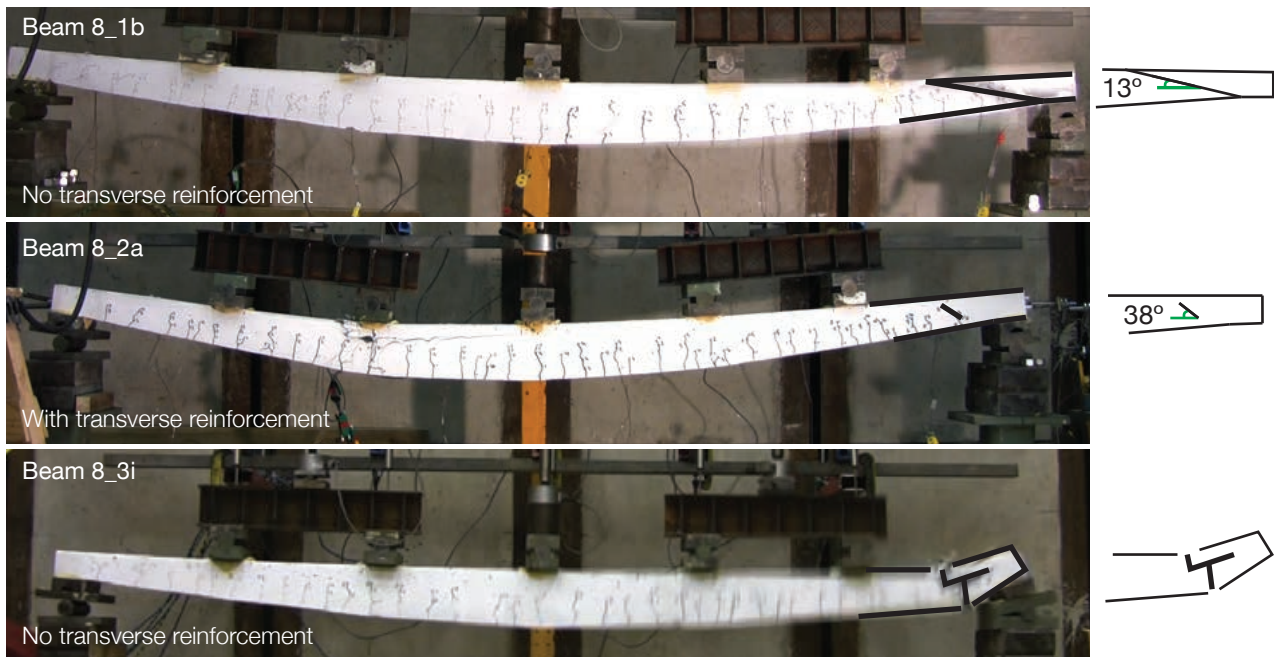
Shear crack angles in 8\_1b and 8\_2a at 25kN load and Beam 8\_3i at 21.5kN.
